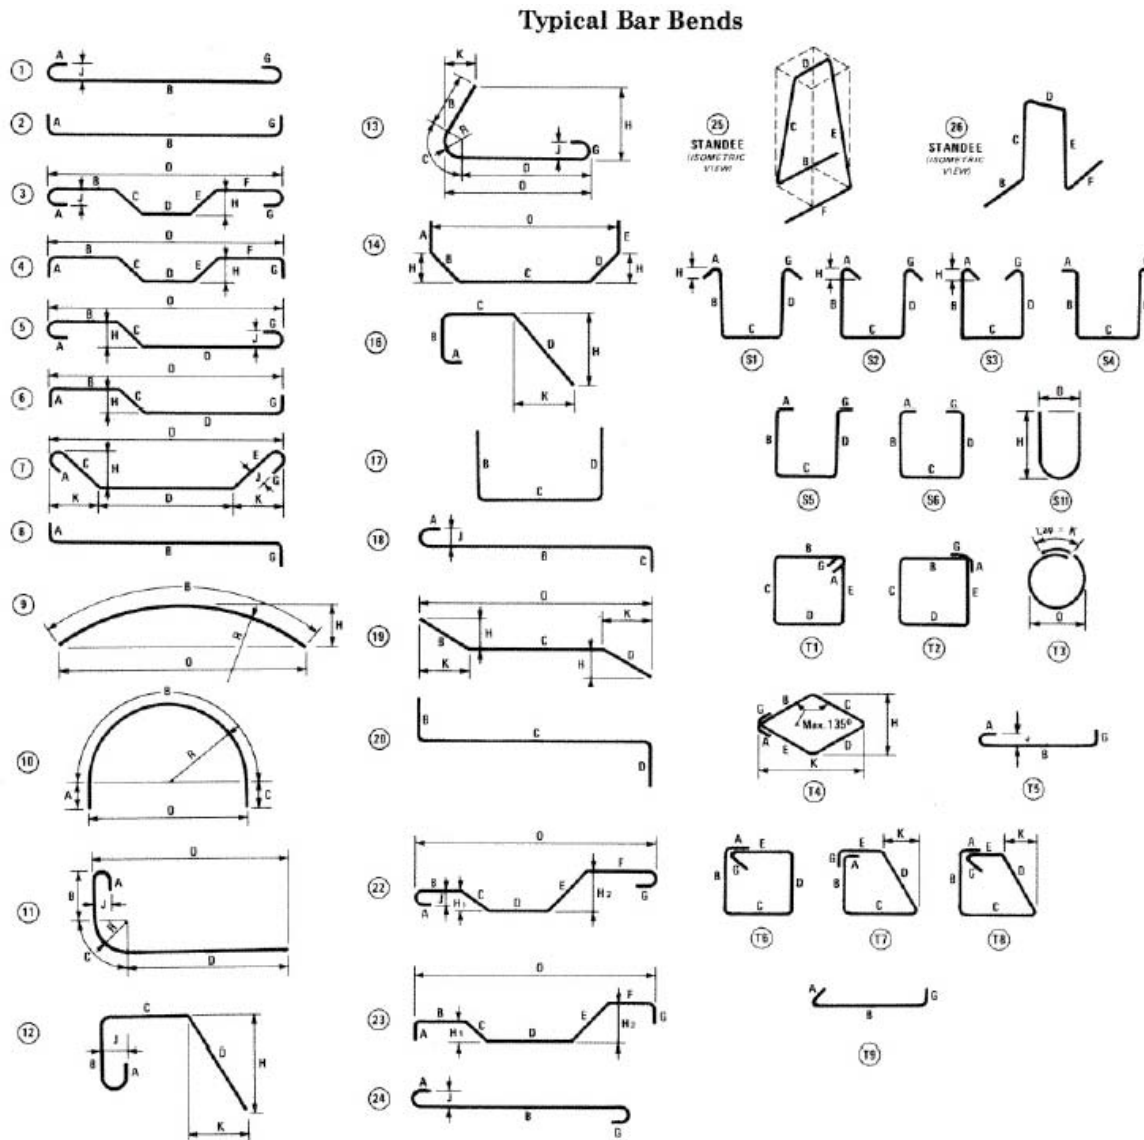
Typical Bend Configurations in Reinforcing Steel Bars
